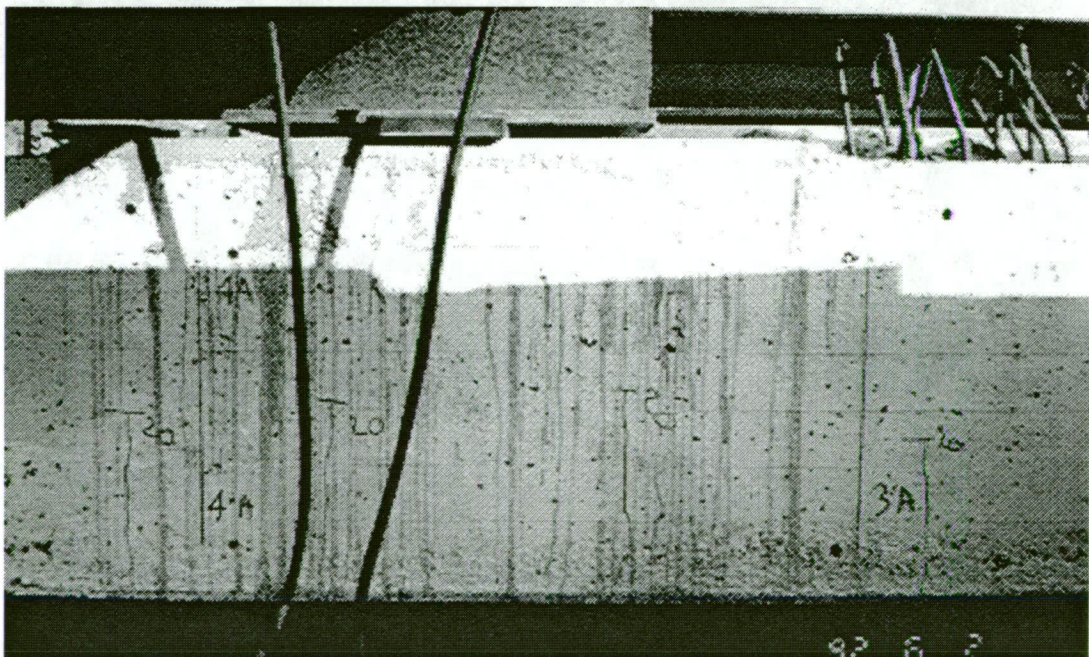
Flexural Beam Crack Patterns
